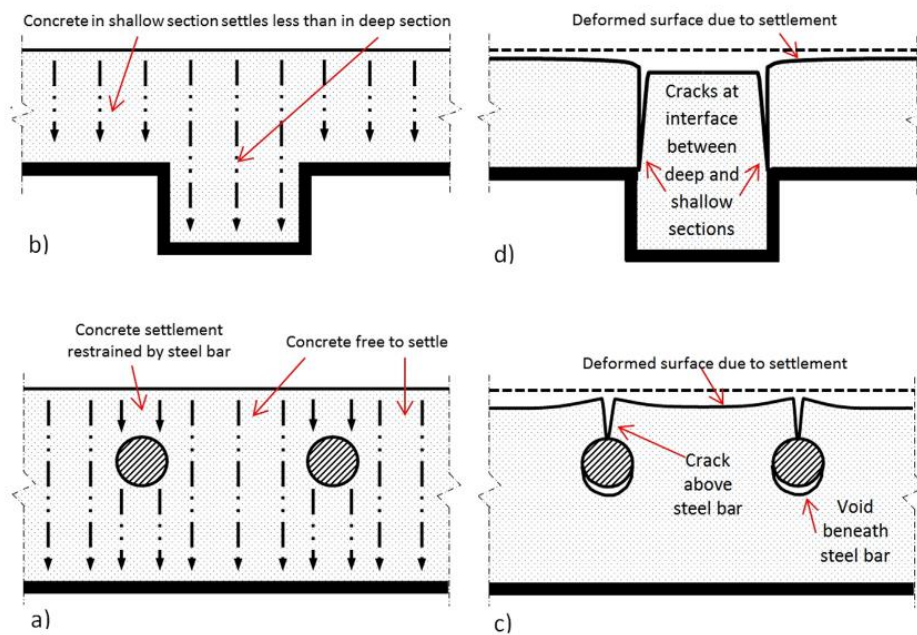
Plastic settlement cracking in a slab and T-beam due to presence of steel reinforcement [22].
